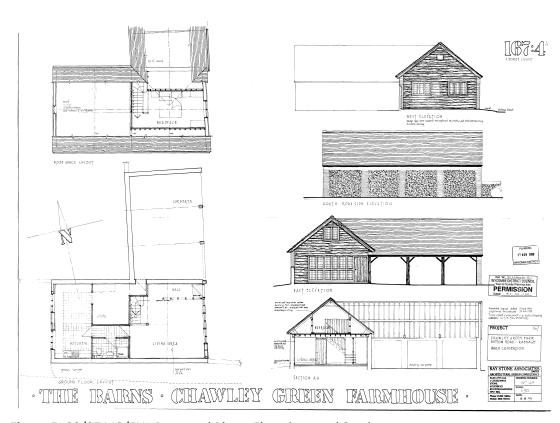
99/07443/FUL Proposed Plans, Elevations and Section
